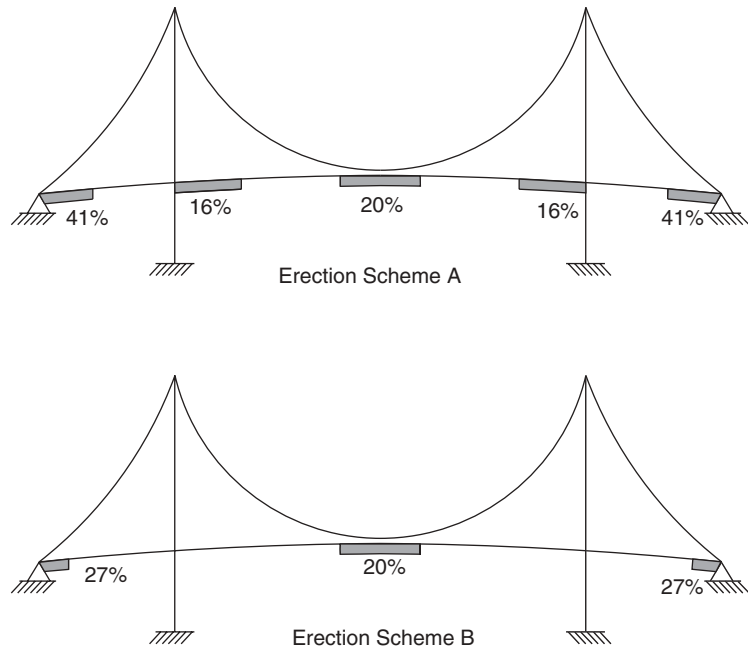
Erection schemes considered for the Storebælt Bridge [92.13]
